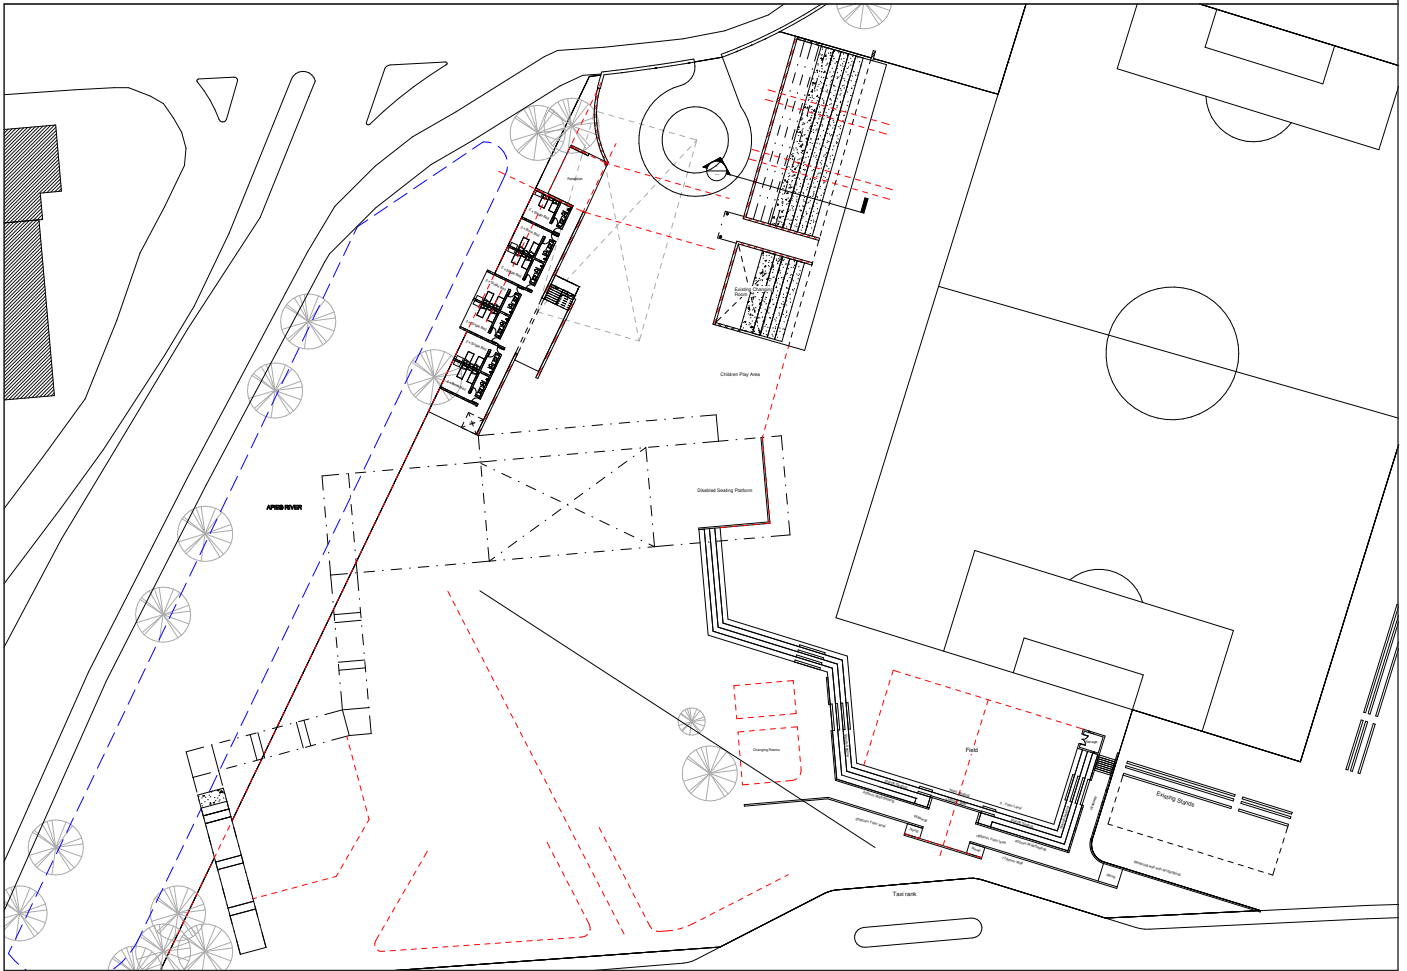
Iteration 2 ground floor plan (Author: 2019)
